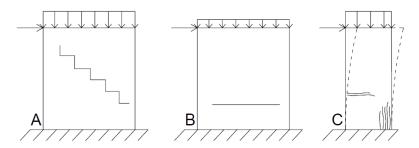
Failure mechanisms that occur in masonry piers due to lateral and vertical loads. Diagonal shear failure (A), Sliding shear failure (B), Flexural failure (C).
